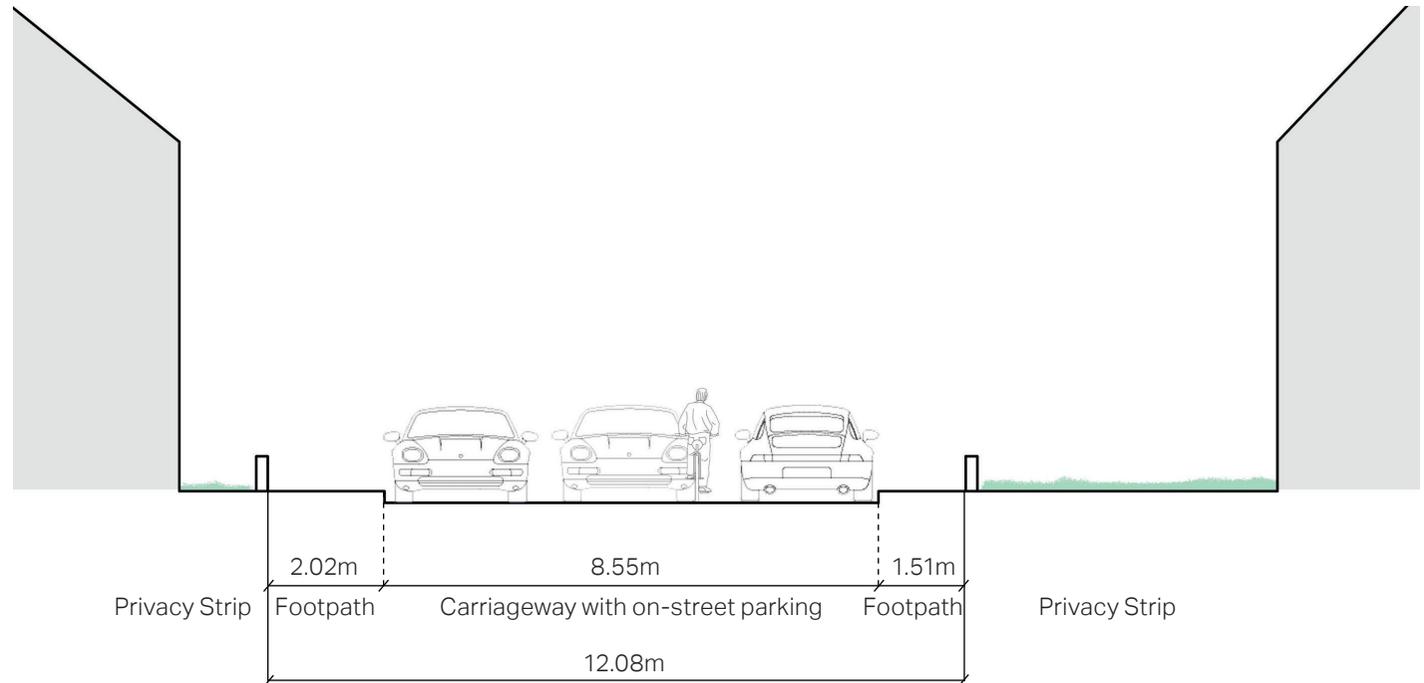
Cross-section showing the dimensions for a section of the existing Semilong Road.
